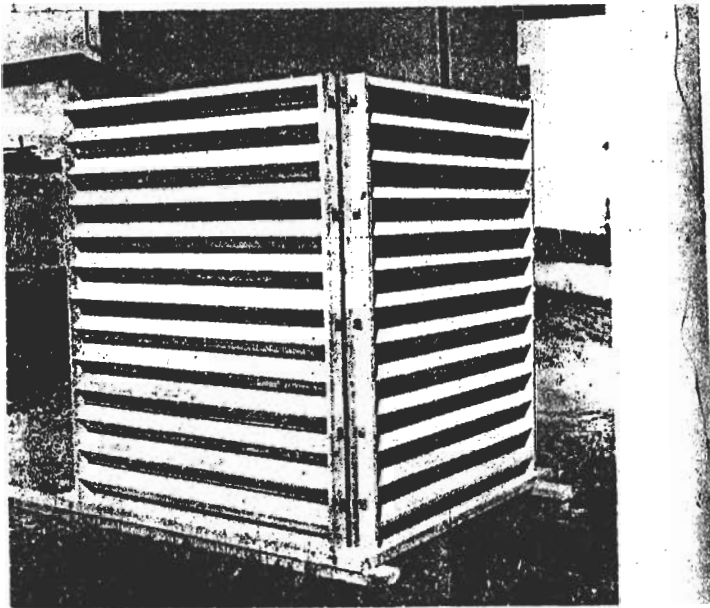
Wooden silo of corrugated pre- fabricated panels
